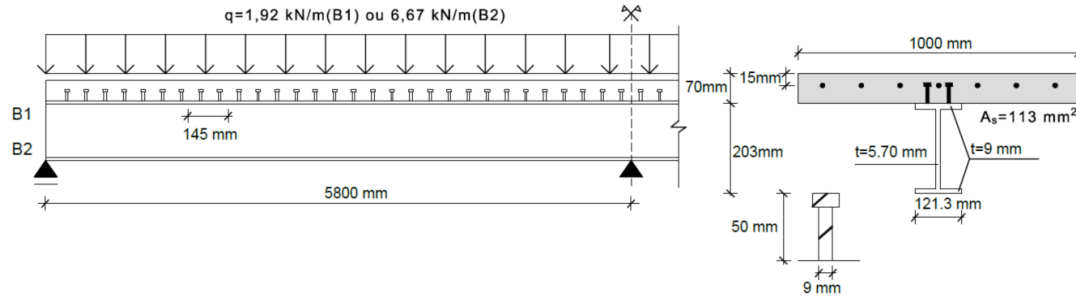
Geometry and cross-section of continuous beams B1 and B2
